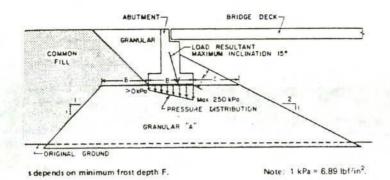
New (1978) abutment footing design, Ontario (39).
